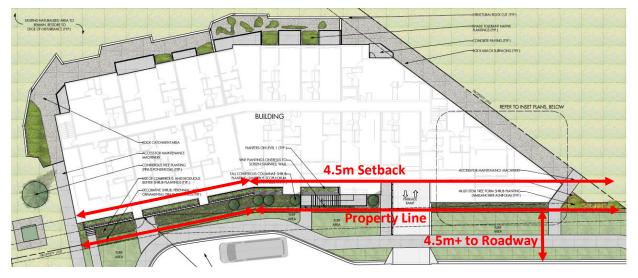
Proposed front setback variance, largely triggered by stairs to apartment lobby.
